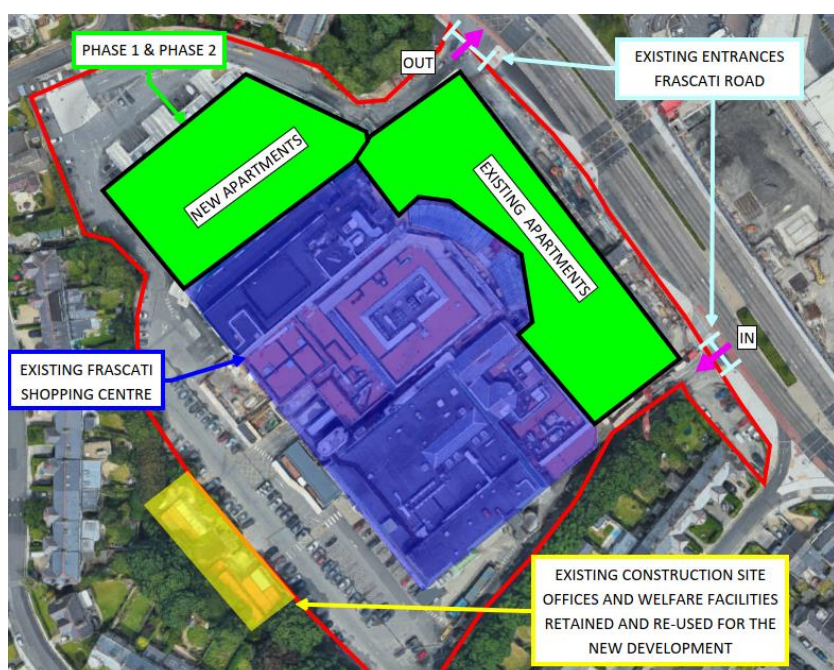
Aerial View Showing Proposed and Existing Access.
